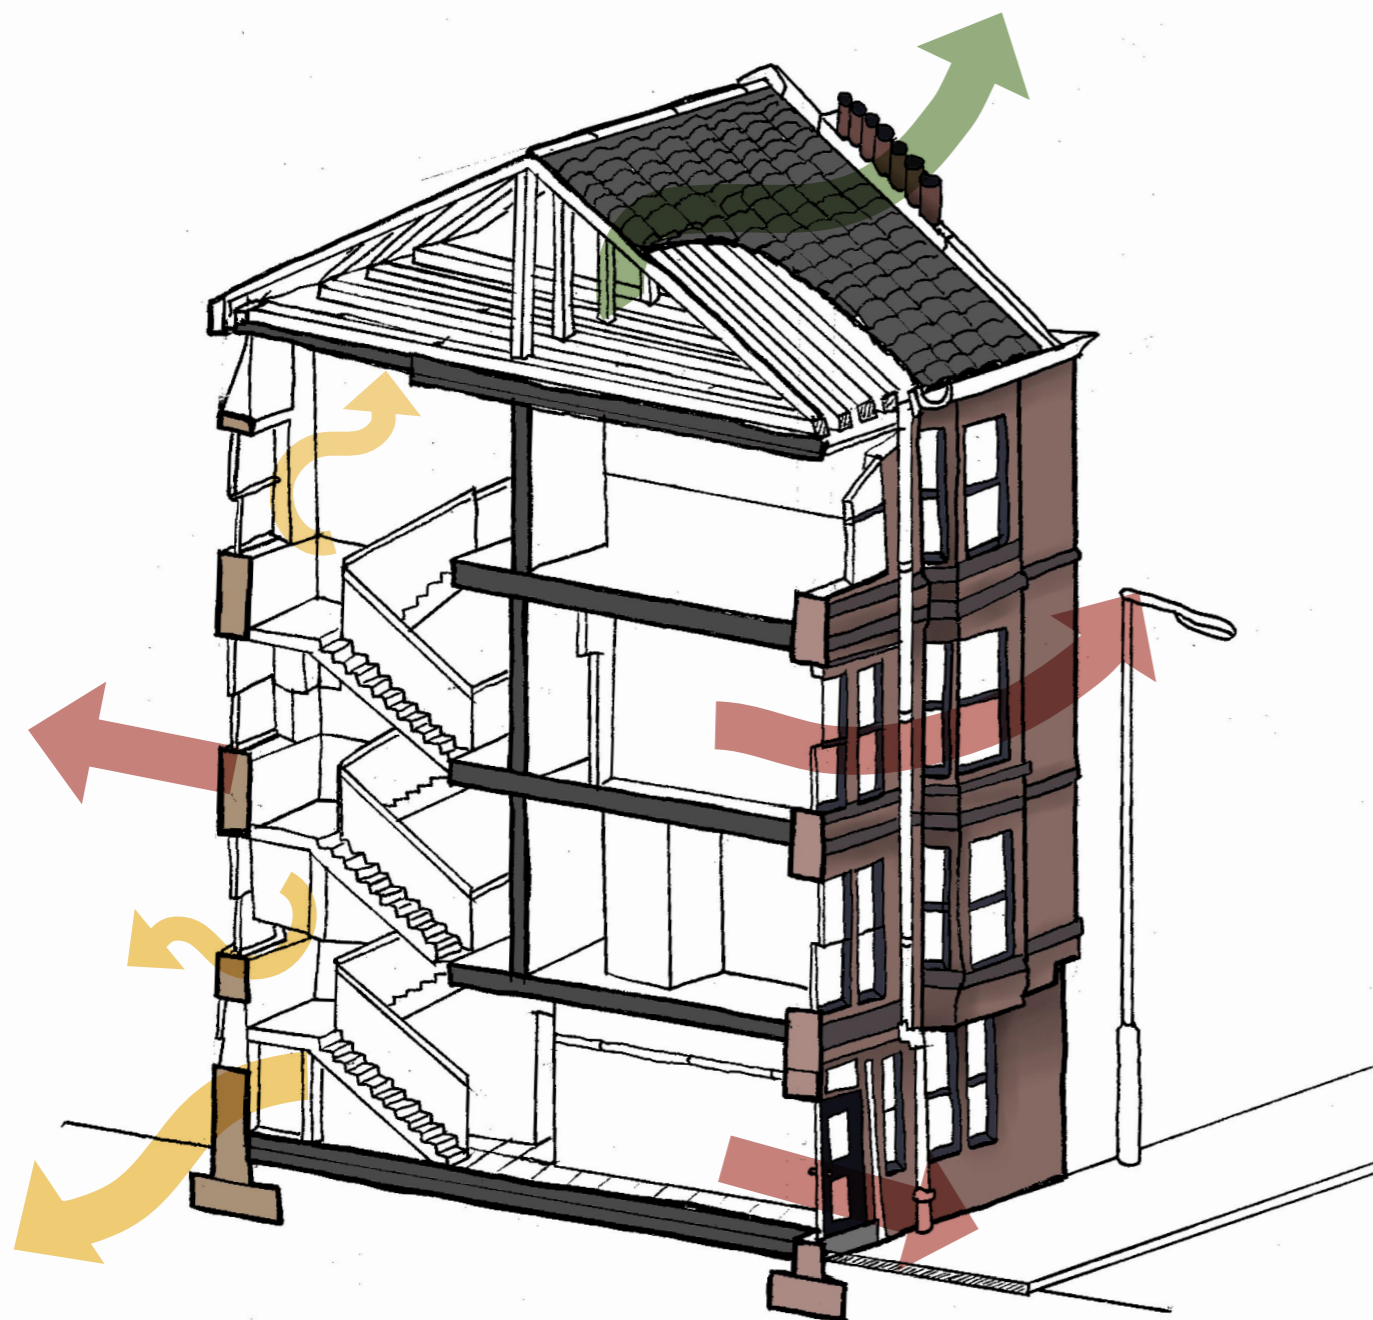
Cutaway Isometric drawing of existing building showing staircore and inside of flats
